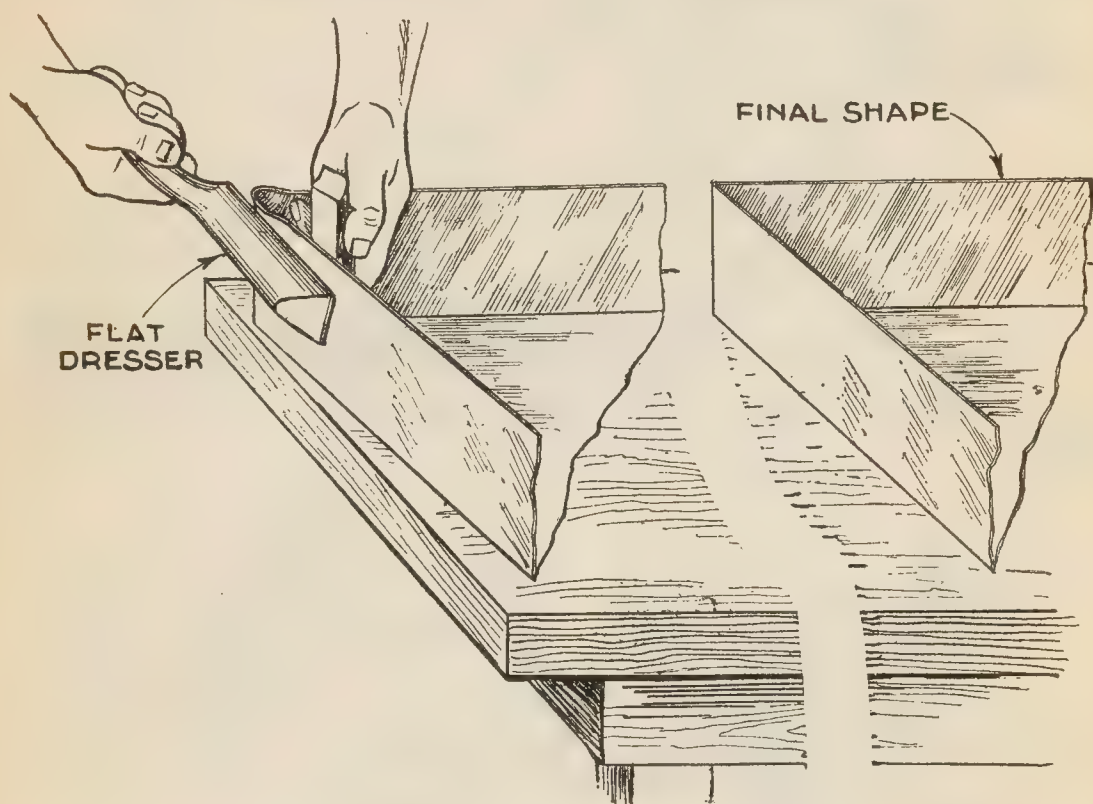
,548.—*Beating box gutter corner, 5.* Sharpening external angle of corner by beating with flat dresser against a flat dresser held inside the angle.
